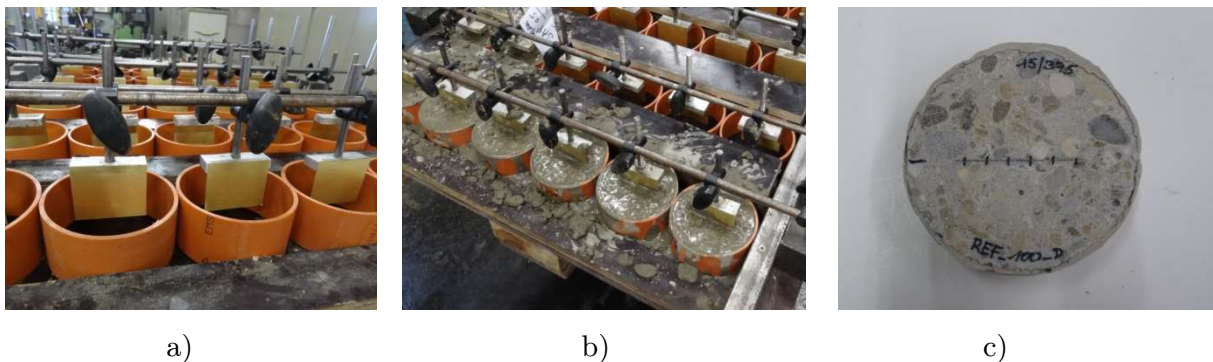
a) Positioning of the brass plates b) Casting of the samples c) Resulting artificial crack
